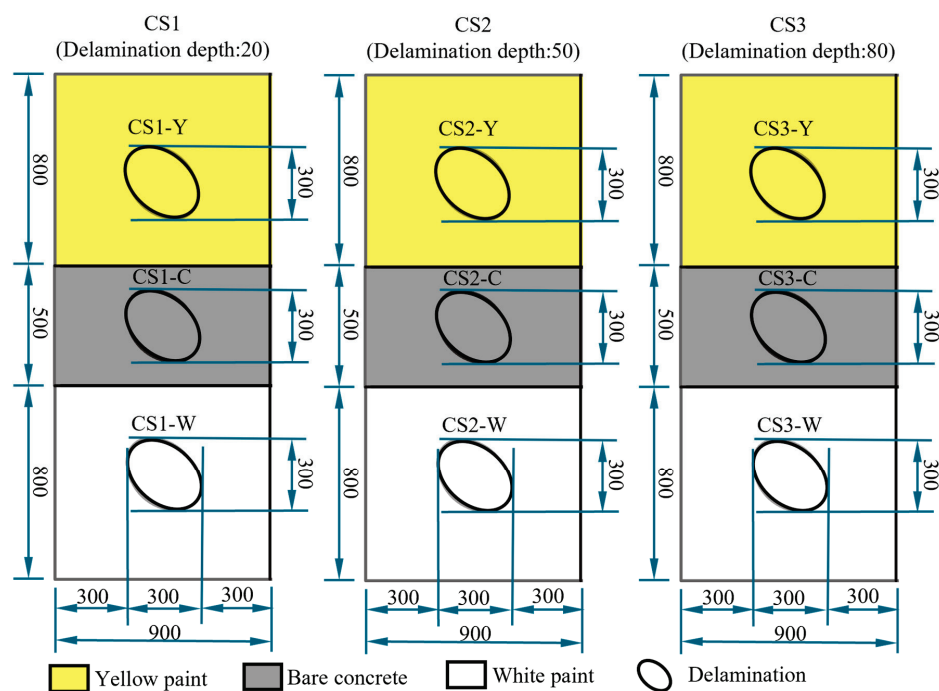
Delamination detection experiment: dimensions of each concrete specimen, surface treatment (units: mm), dimensions of each delamination and delamination arrangement (C, Y, and W representing concrete, yellow paint, and white paint).
